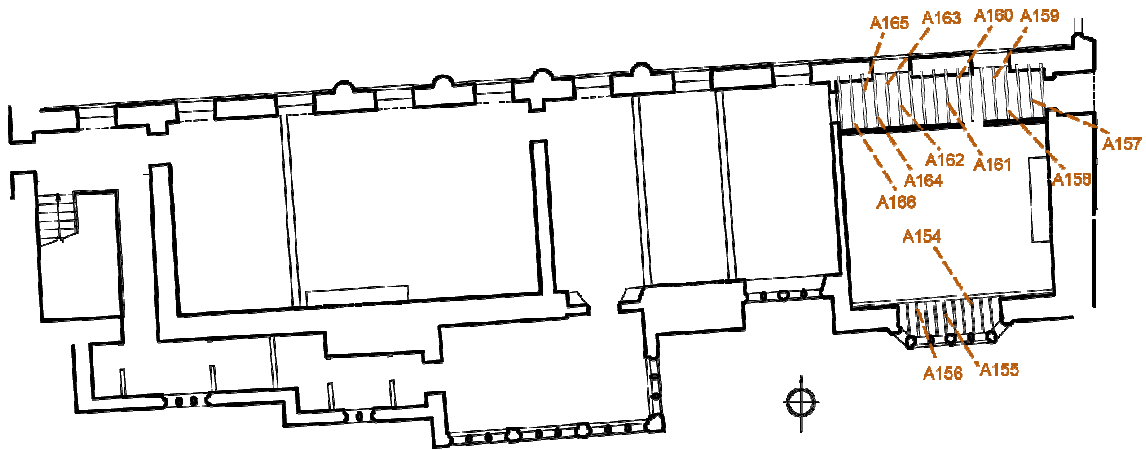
First-floor ceiling of the South range, showing locations of samples APT-A154–66
